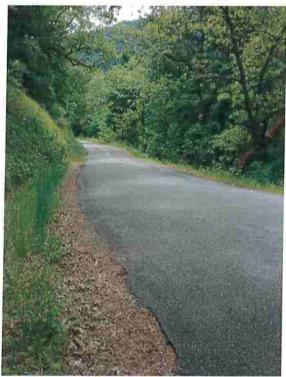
BMR PM 0.9, 20-ft wide asphalt surface with a longitudinal slope of 11%.
